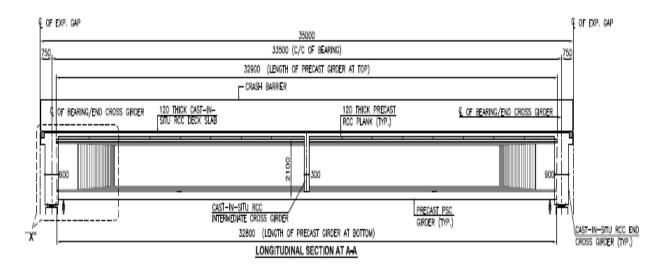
Longitudinal Girder Section of 35m c/c exp joint
